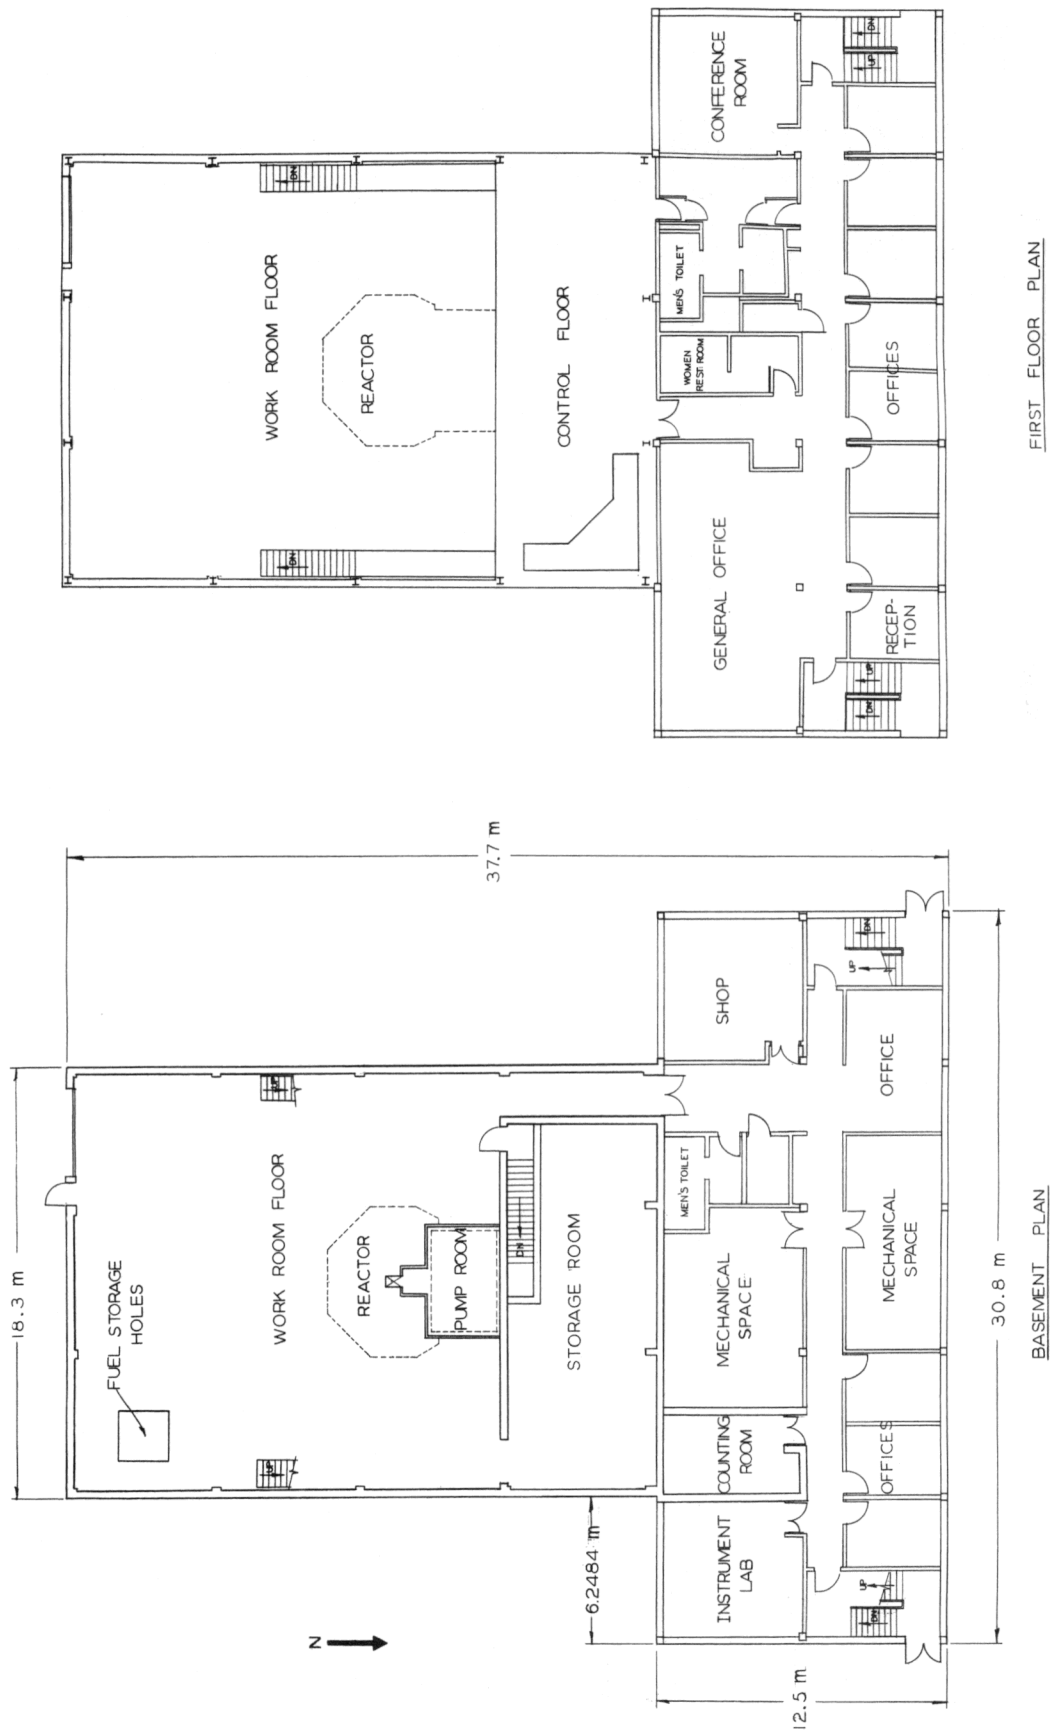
JUGGERNAUT Building 335 - Floor Plan
